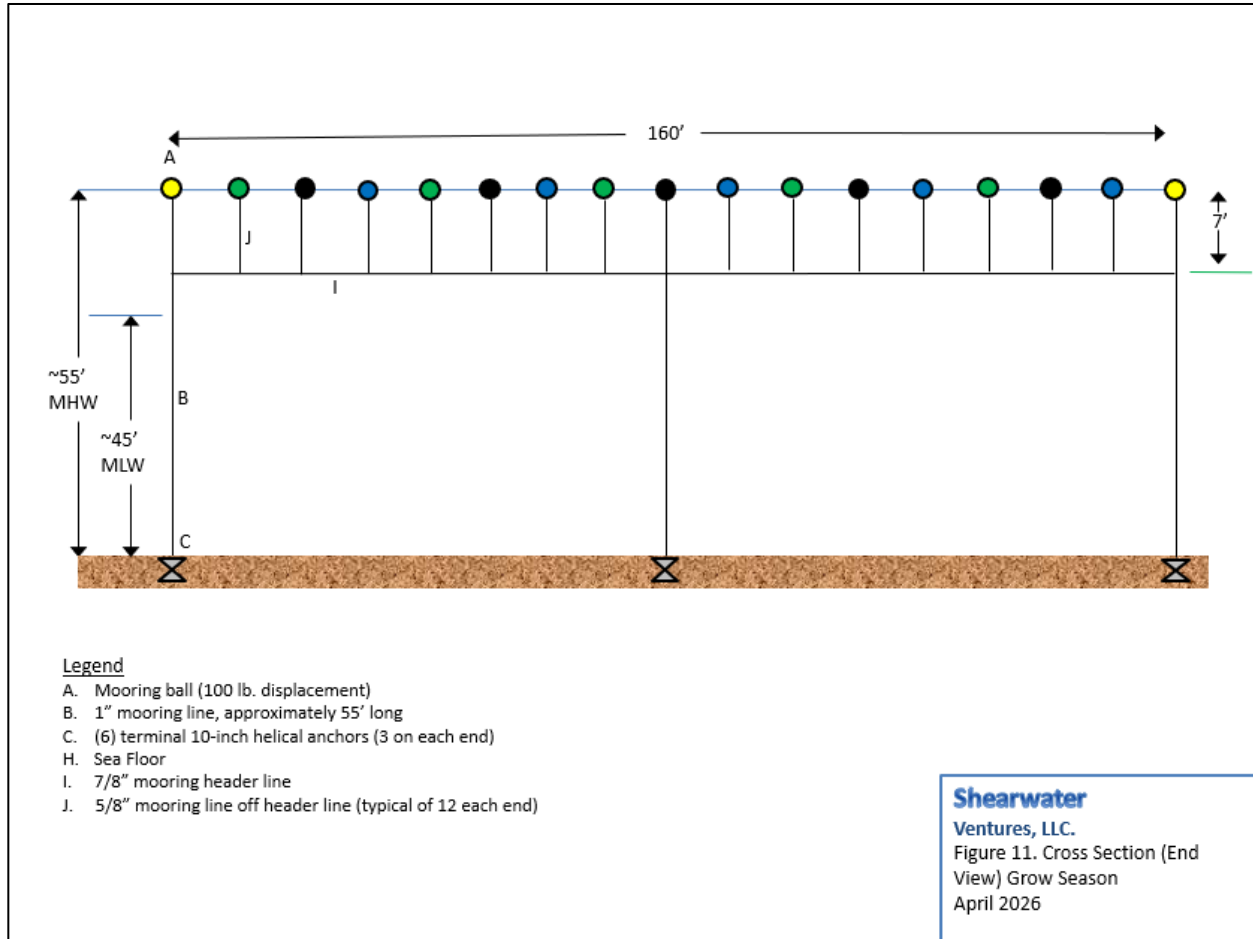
Gear Schematics – Cross Section View (end view). Grow season.
